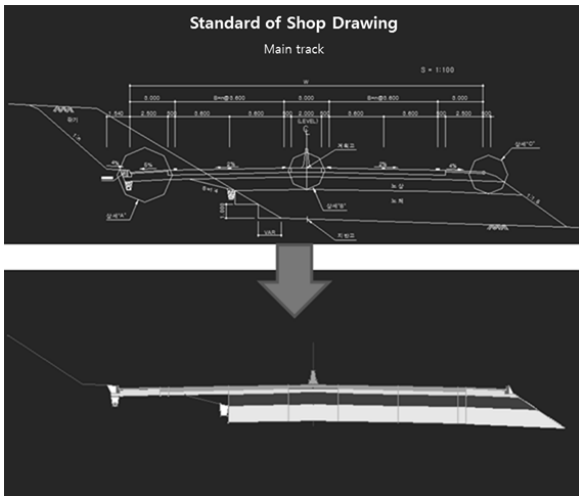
Civil 3D Assembly of Reference to Roadway Cross-section View
